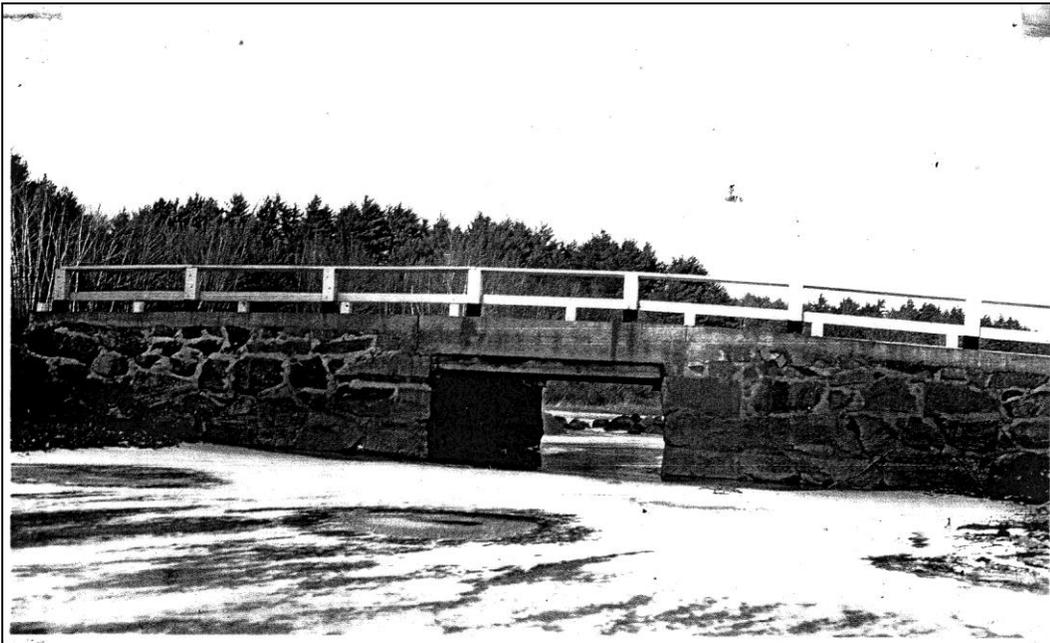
Photo of Center Harbor Bridge 080/040, December 11, 1941, showing west (upstream) side of bridge (NHHD Bridge Card 1941).
